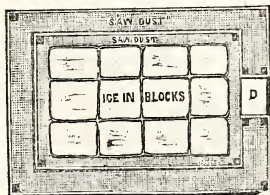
Ice-house above Ground. One door is enough for common sized houses.
